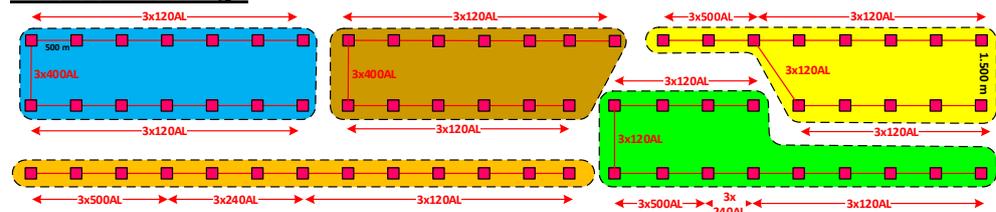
Option 1 – Alternative 1 – Array cable routing and cross section
